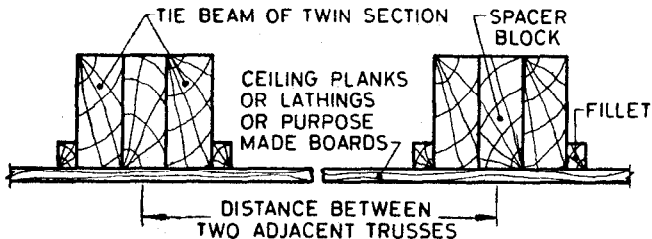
OPEN CEILING BELOW TIE BEAM OF TWIN SECTION
